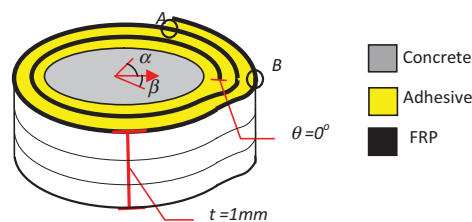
Idealized cross-section of FRP-wrapped concrete column
